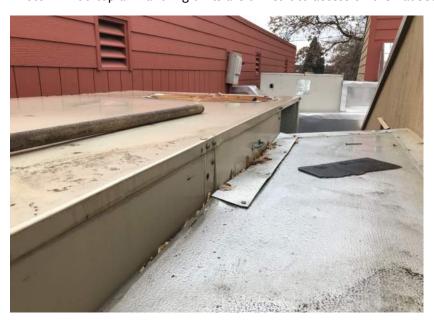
Access to air filter is blocked by duct insulation. Seam between air handler and duct insulation is not watertight.
